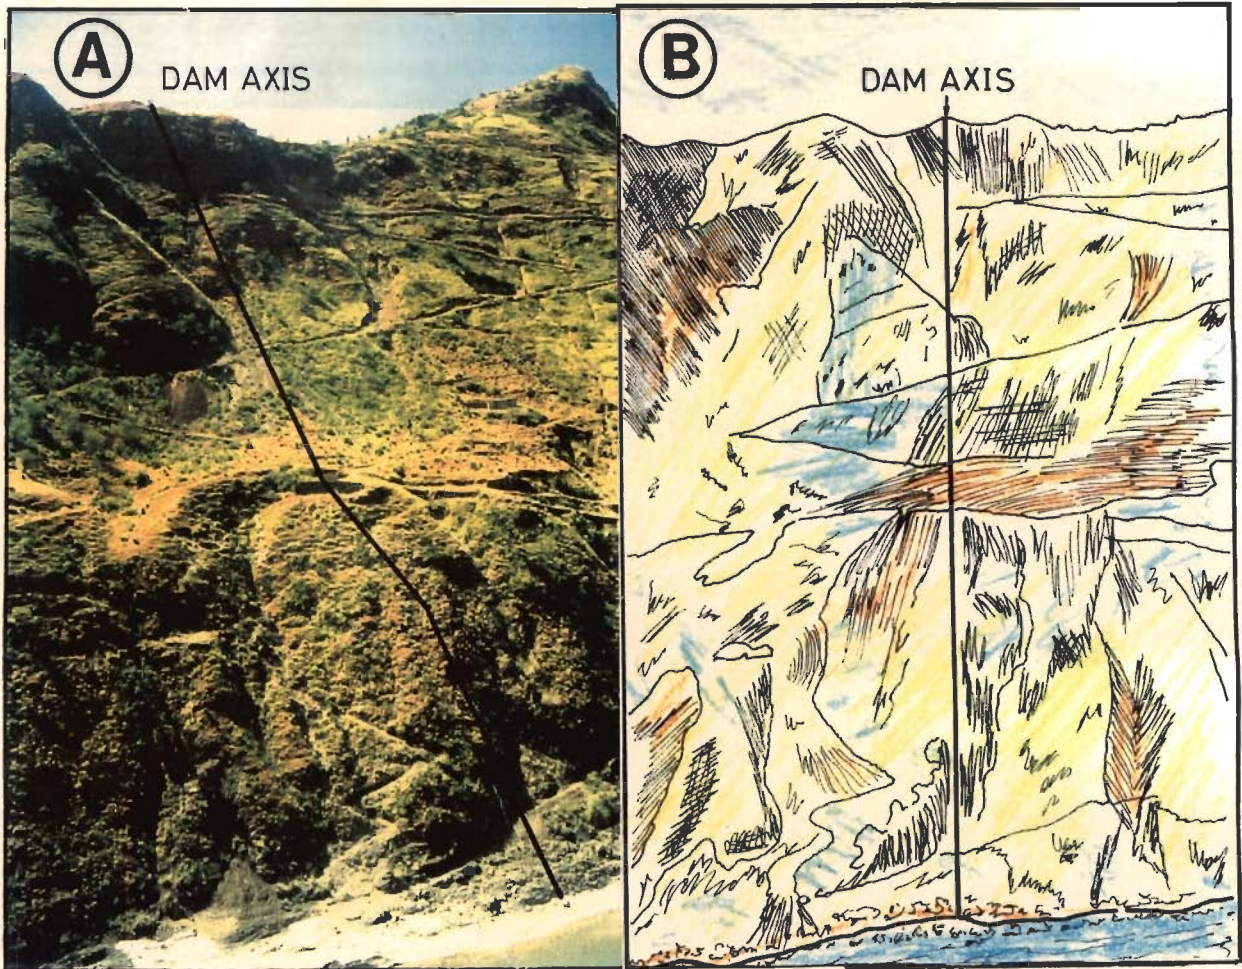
A - A VIEW OF RIGHT ABUTMENT SHOWING DAM AXIS
